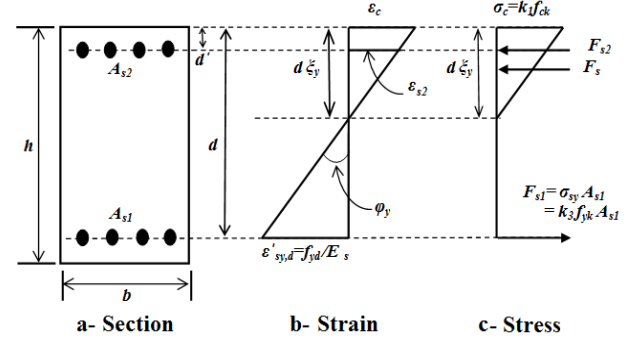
Behavior of reinforced concrete beam section in flexure at first yield
